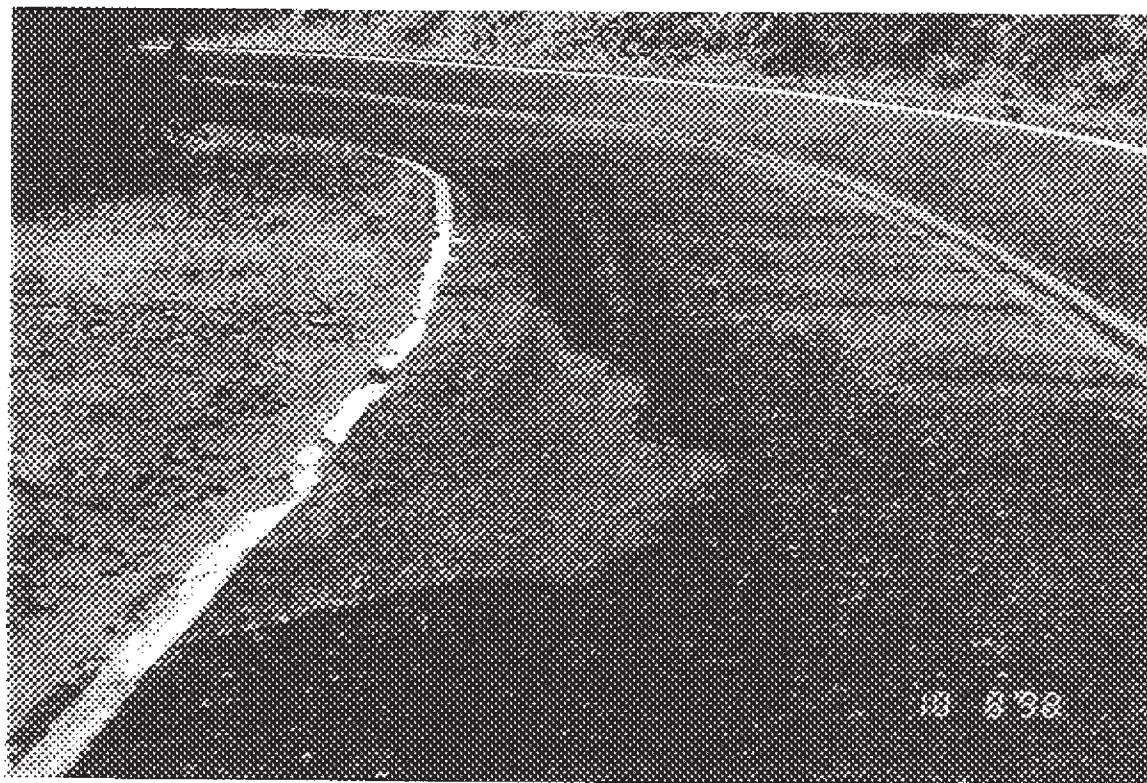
MP 7.00 - Subgrade failure, local cracking
